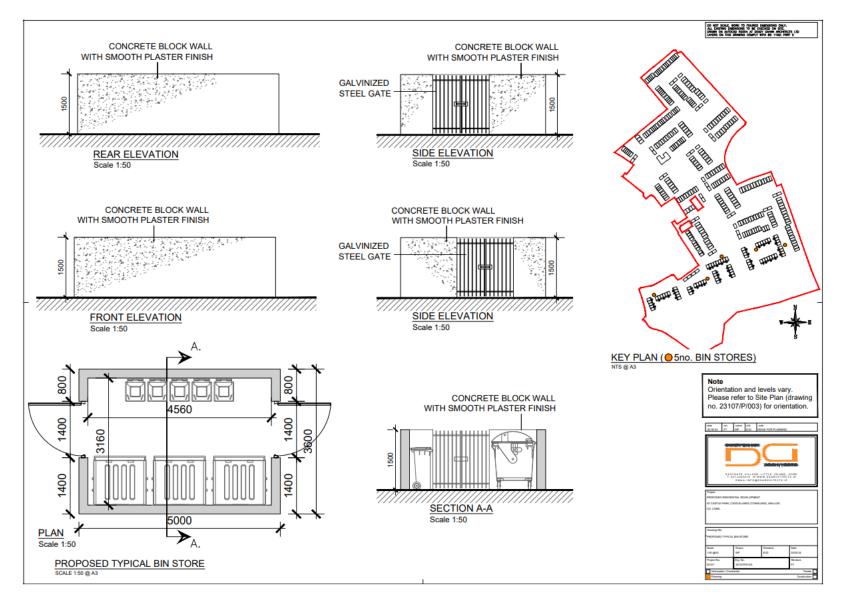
Location and Typical Internal Layout of the Shared Waste Storage Areas (Orange)
